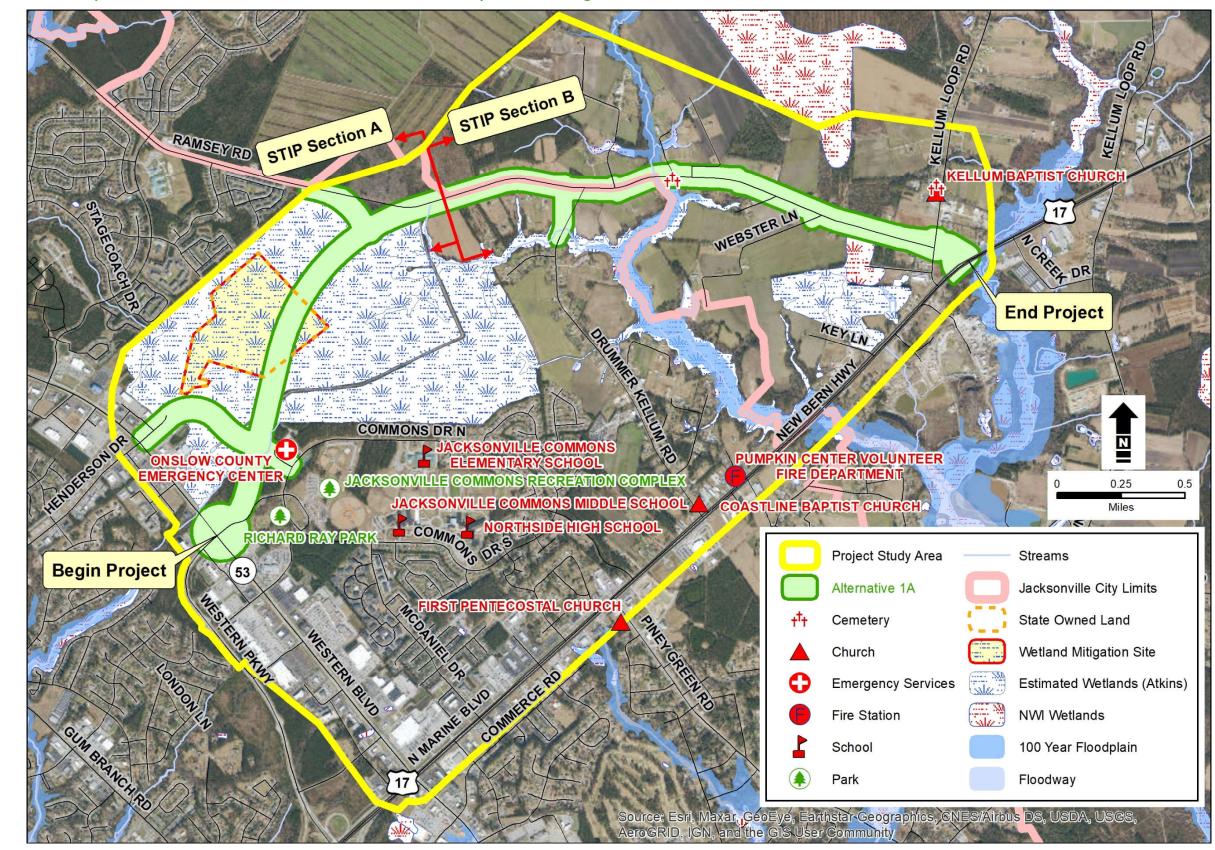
Corridor Concept Alternative 1a: New Northwestern Location and Ramsey Road Widening
